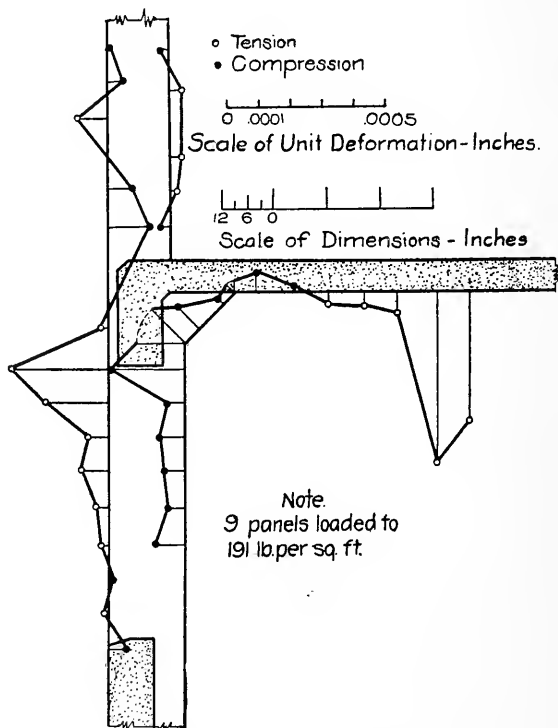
DEFORMATIONS IN WALL COLUMN NO. 25 AND POINT OF ZERO UNIT-DEFORMATION ON UNDER SURFACE OF TEST FLOOR NEAR WALL COLUMN, SHREDDER WHEAT FACTORY.
